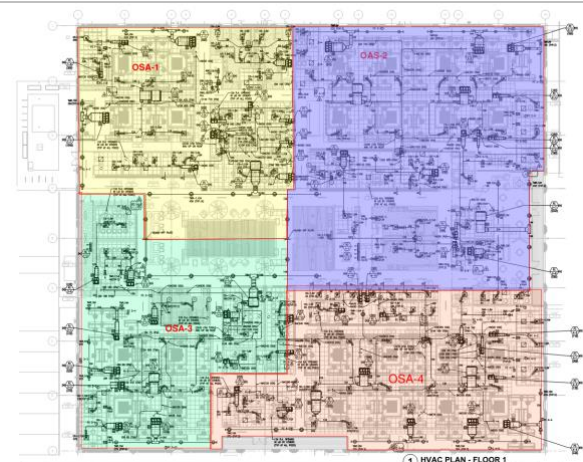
EXAMPLE FLOOR PLAN OF DOAS VENTILATION ZONES USING 4 DOAS UNITS
